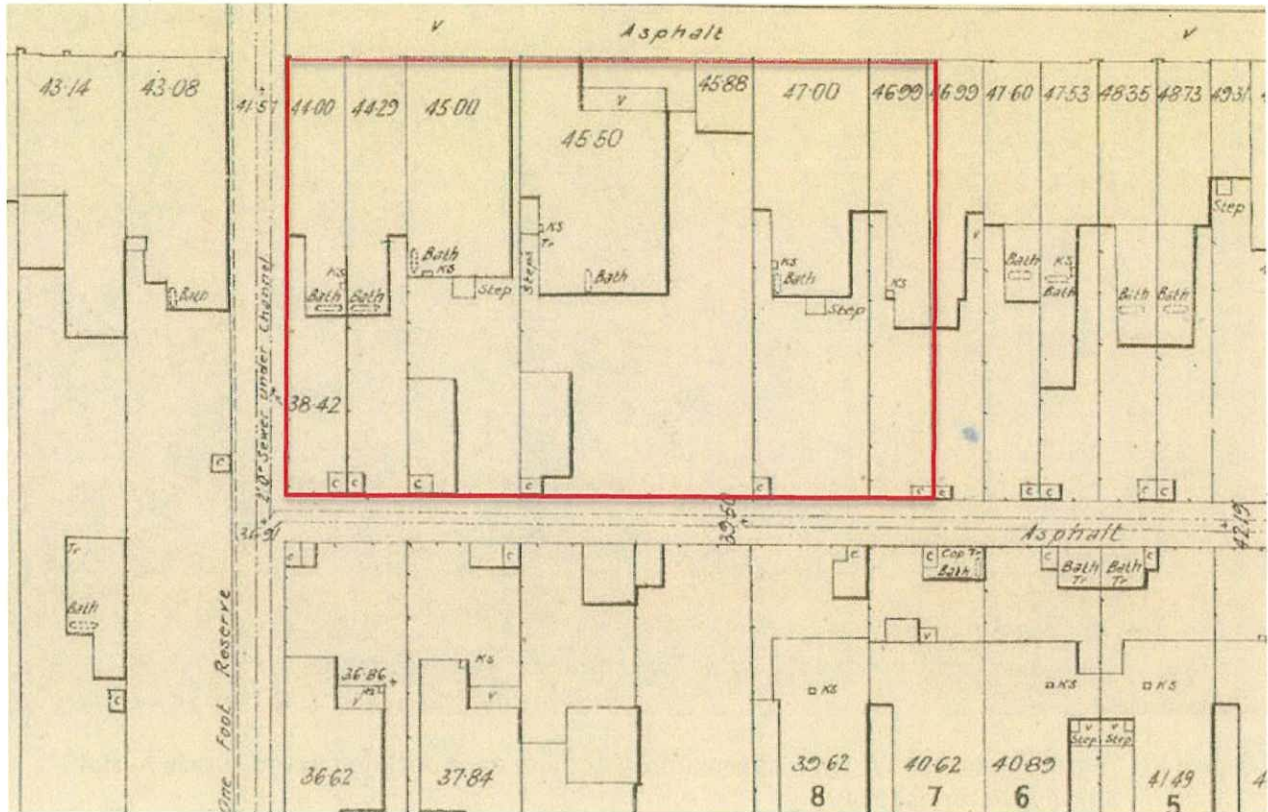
Melbourne Metropolitan Board of Works detail plan, 1905, approximate Activity Area outlined in red, (Melbourne Metropolitan Board of Works, 1905)
